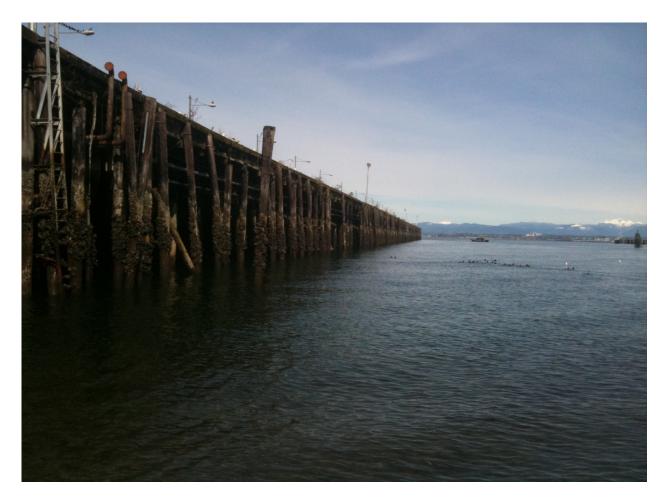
Creosote-treated timber pilings supporting the Tank Farm pier.
